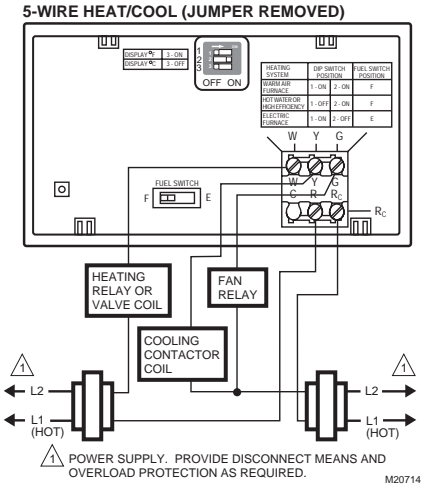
Typical hookup in five wire heat and cool (jumper removed) application.
